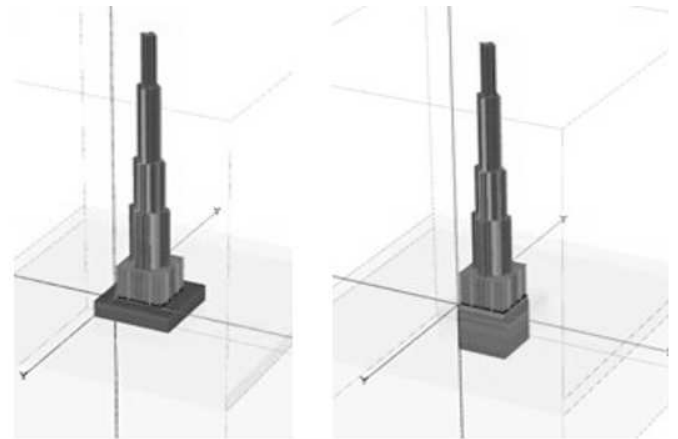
Tall building structure with shallow foundation and jet grouting, piled raft in PLAXIS 3D
